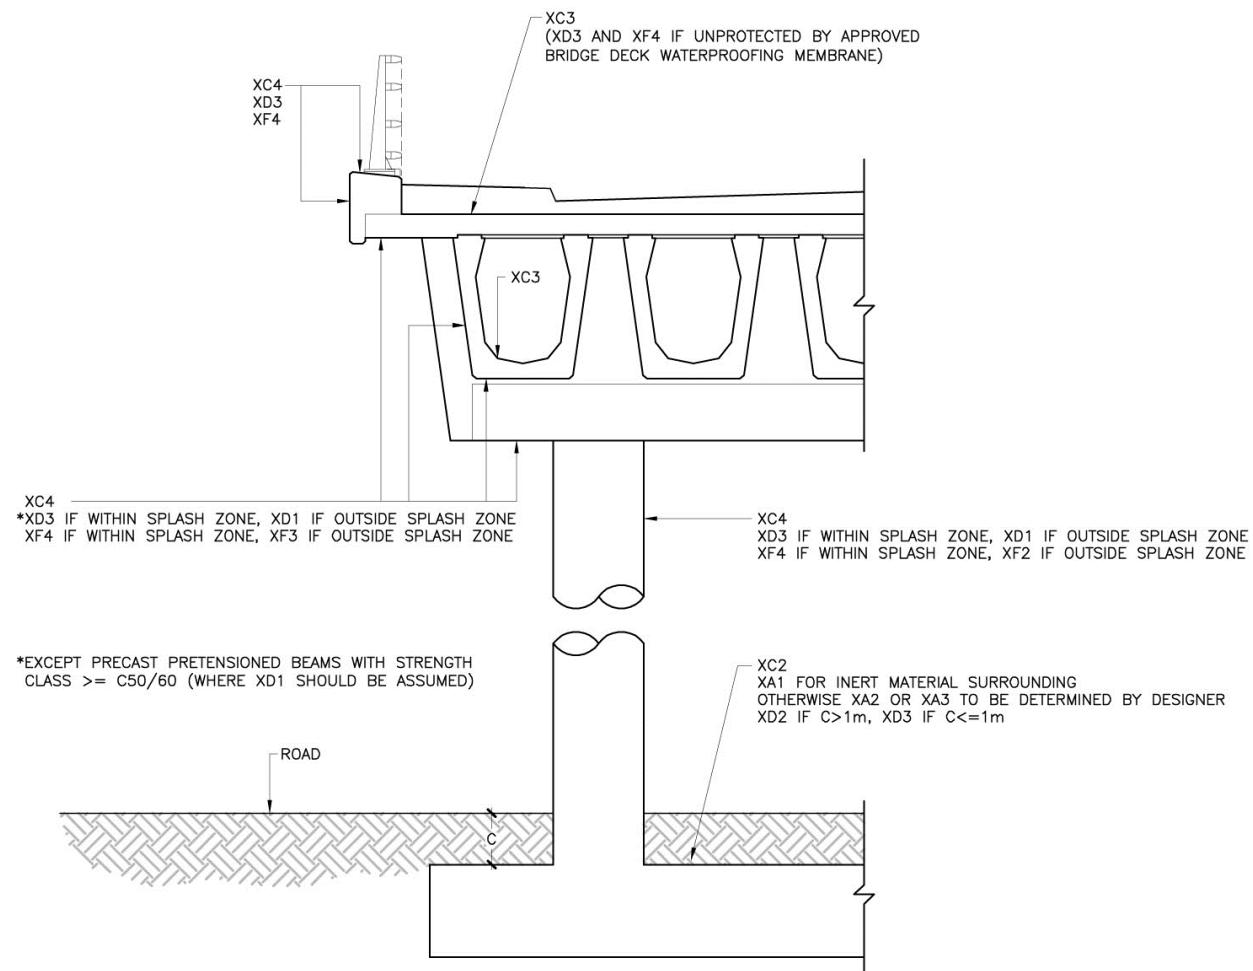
Overbridge Structure (Road Over Road) – Intermediate Support & Deck
